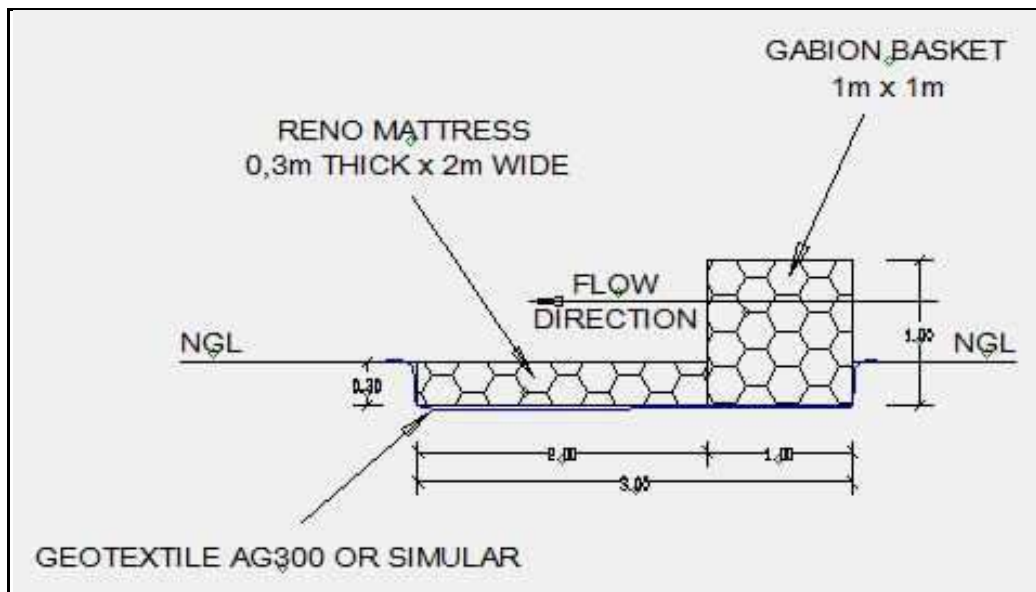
Proposed gabion structures (Source: ELEMENT Consulting Engineers)
